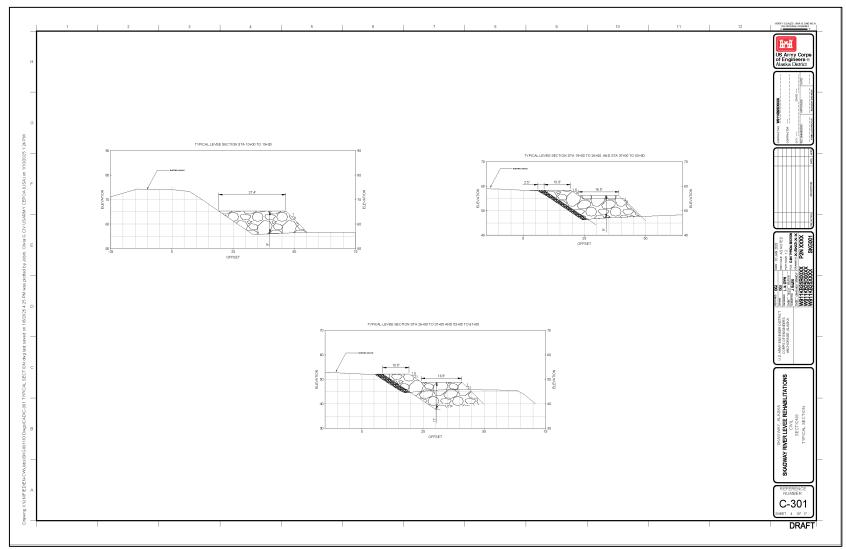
Typical levee cross section; C-301 TYPICAL SECTION.
